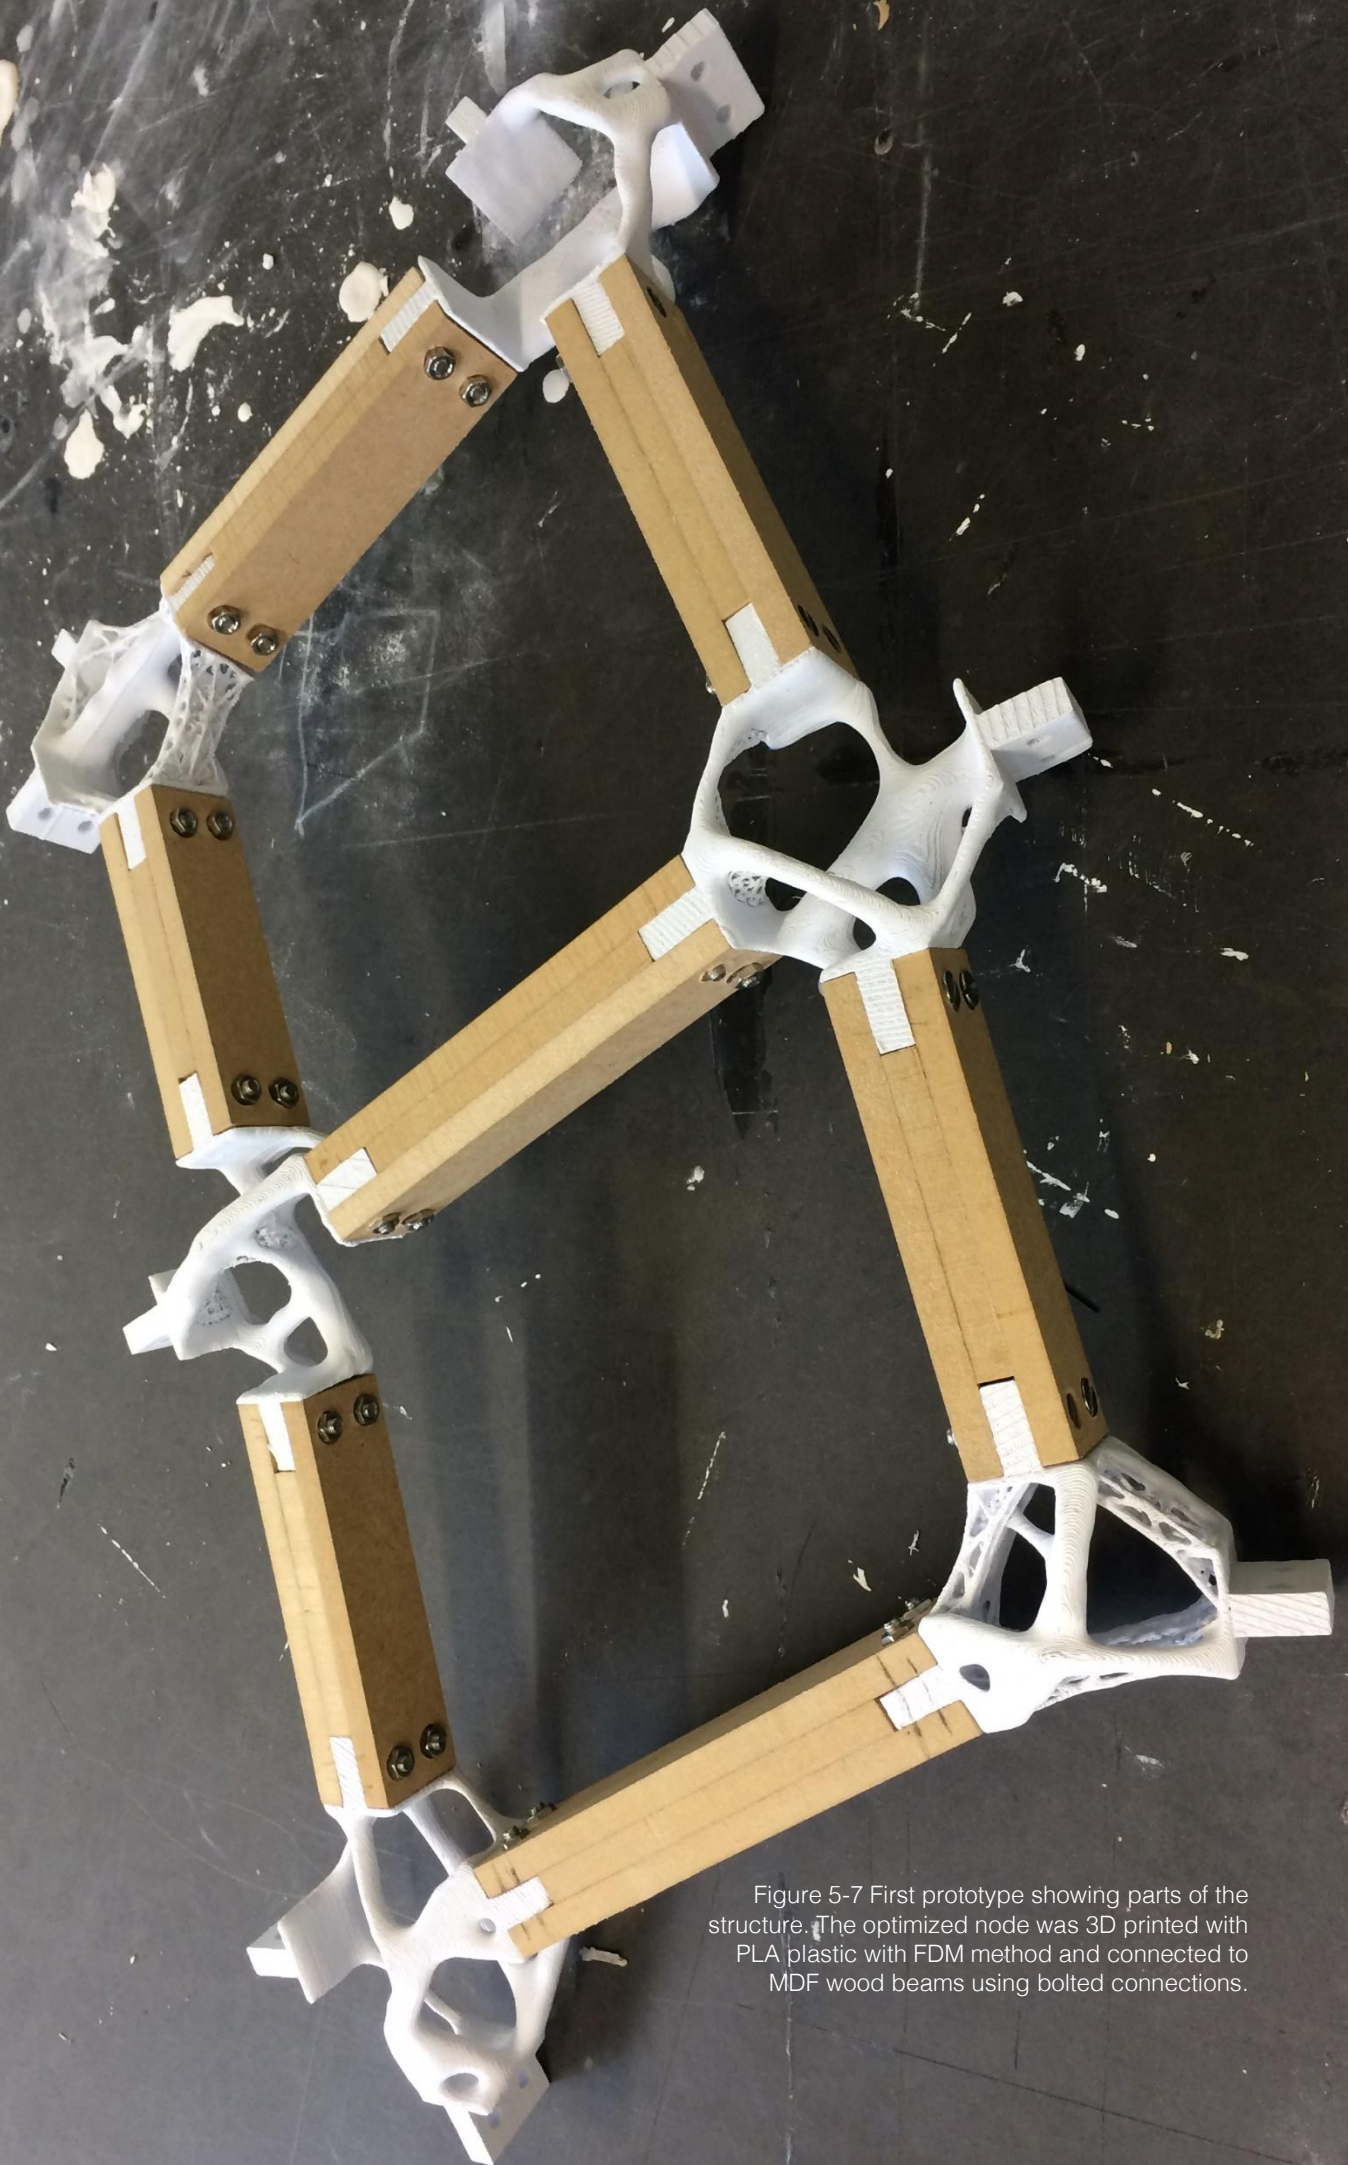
First prototype showing parts of the structure. The optimized node was 3D printed with PLA plastic with FDM method and connected to MDF wood beams using bolted connections.
